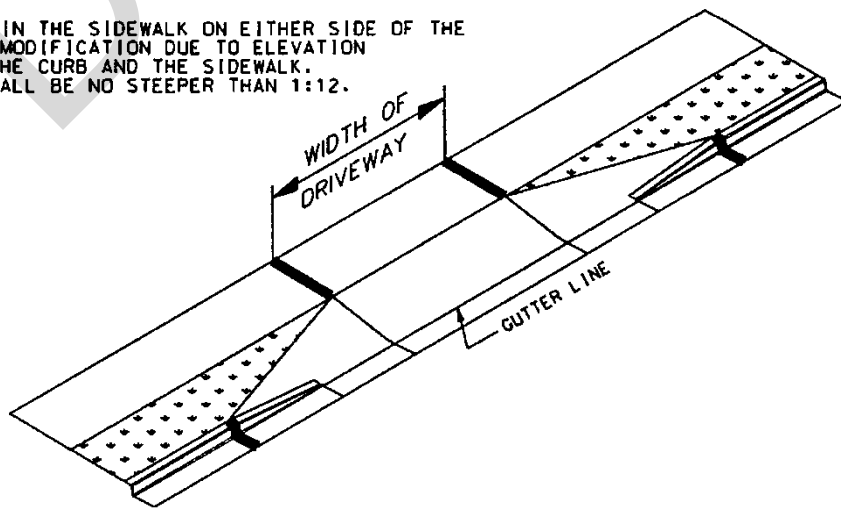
DETAIL OF STANDARD DROP-CURB DRIVEWAY
